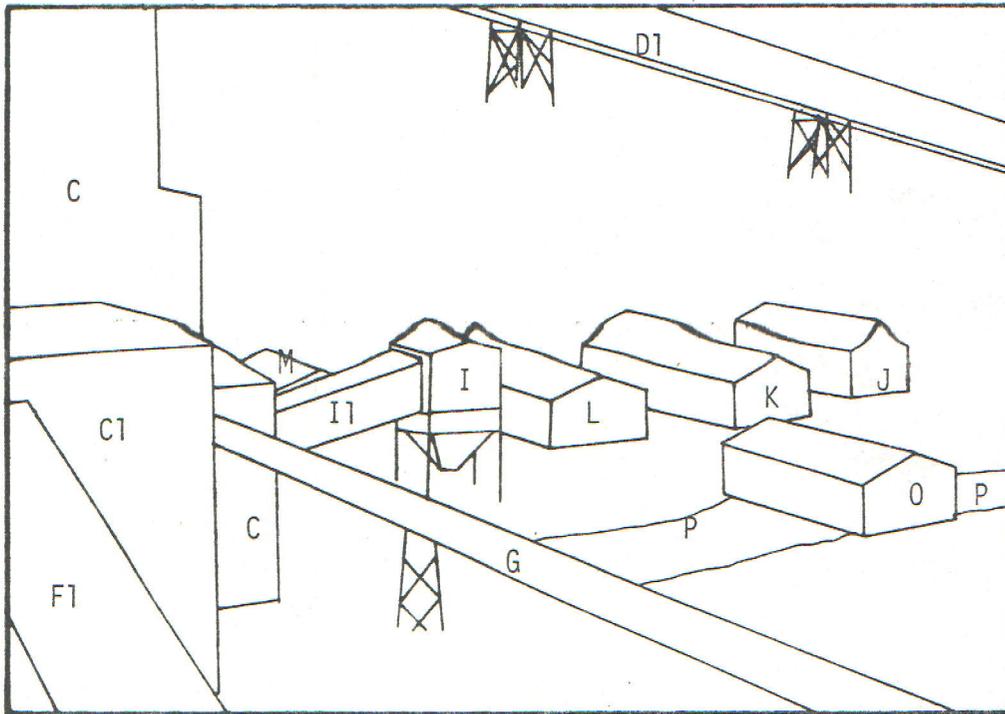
Looking West: C-Coal Cleaning Plant Building; C1-Clean Coal Loading Point; D1-Raw Coal Conveyor; F1-Dry Coal Conveyor; G-Refuse Pipeline and Supporting Structure; I-Coarse Refuse Bin; I1-Coarse Refuse Conveyor; J-Office Building; K-Storehouse; L-Shop; M-Coal Carbonization Lab; O-Plant Pumphouse; P-Auxiliary Pond
